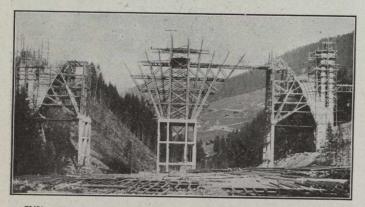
View of Falsework Under Construction, Showing Side Falsework Bents.
